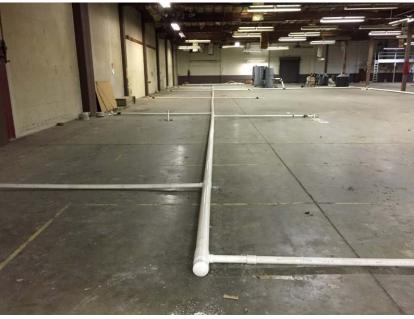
View of SVE well piping and central collection piping. SVE system visible in distance.
